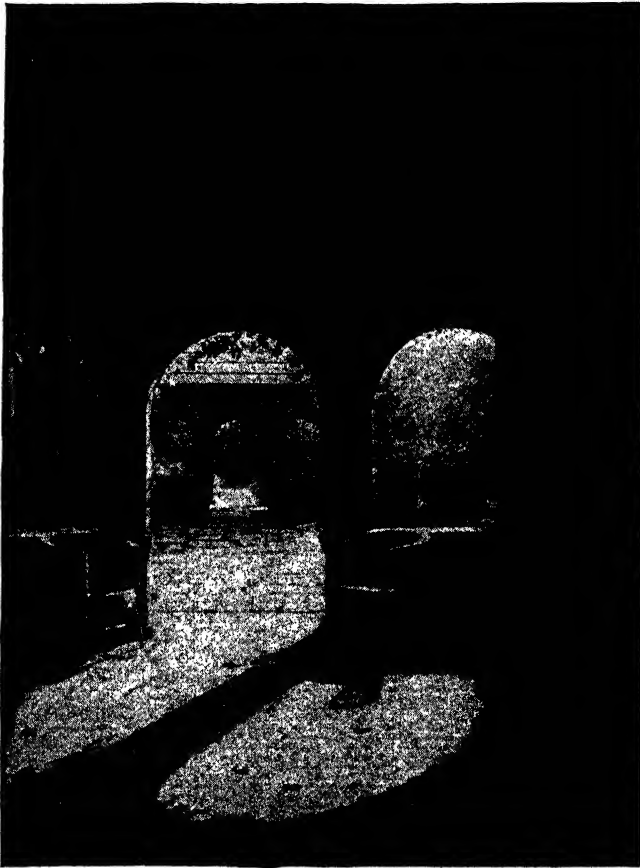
Brick loggia and open porch with brick floor. (*Courtesy of Butler and Corse, Architects.*)
